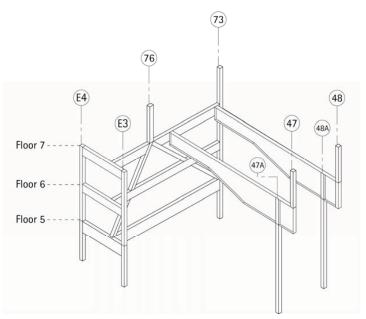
Example of interconnected transfer structures in WTC7 (Truss 1)
